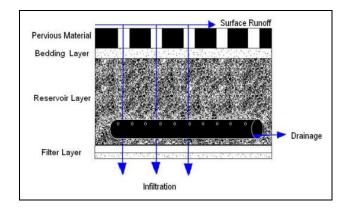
Cross Section of Typical Permeable Pavement (Source: Hunt & Collins, 2008)
